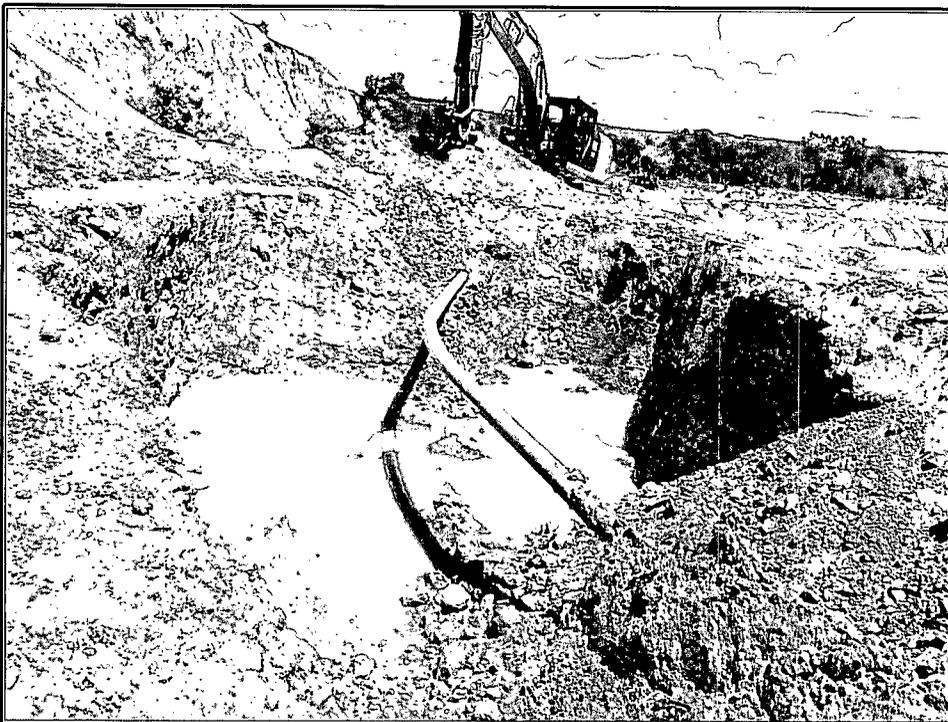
View of the final excavation activities on the northern half containing stormwater.
